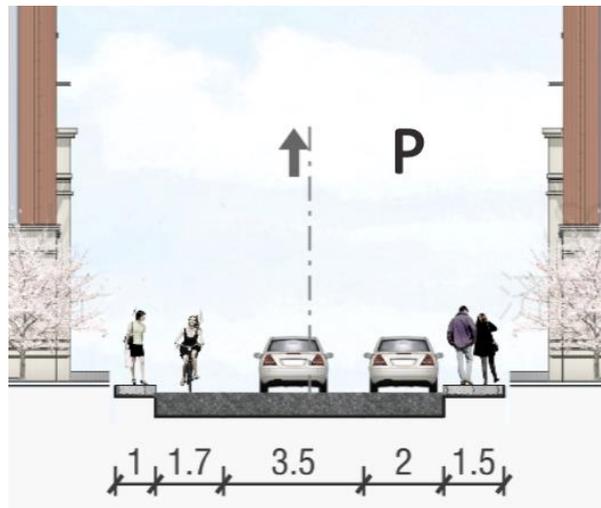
Narrow sidewalk (left side) opposite to a car parking space (right side)
